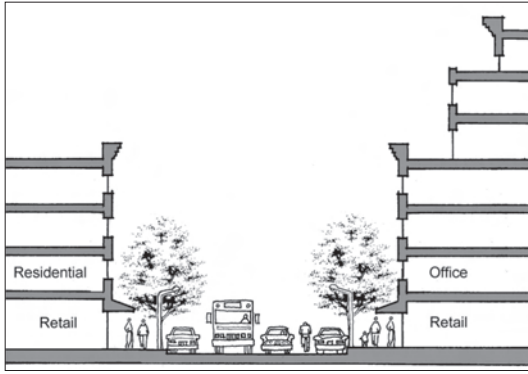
C.74: Taller buildings should be designed to step back or modulated in order to create compatible building forms on either side of a street.
